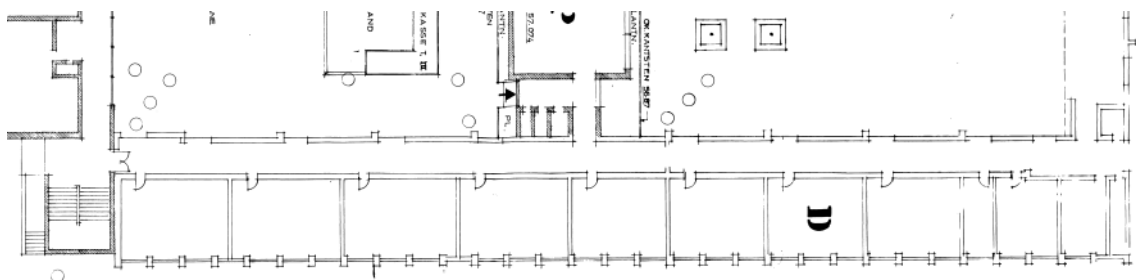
Section D of the school with 8 classrooms (11-18) and three meeting rooms.
